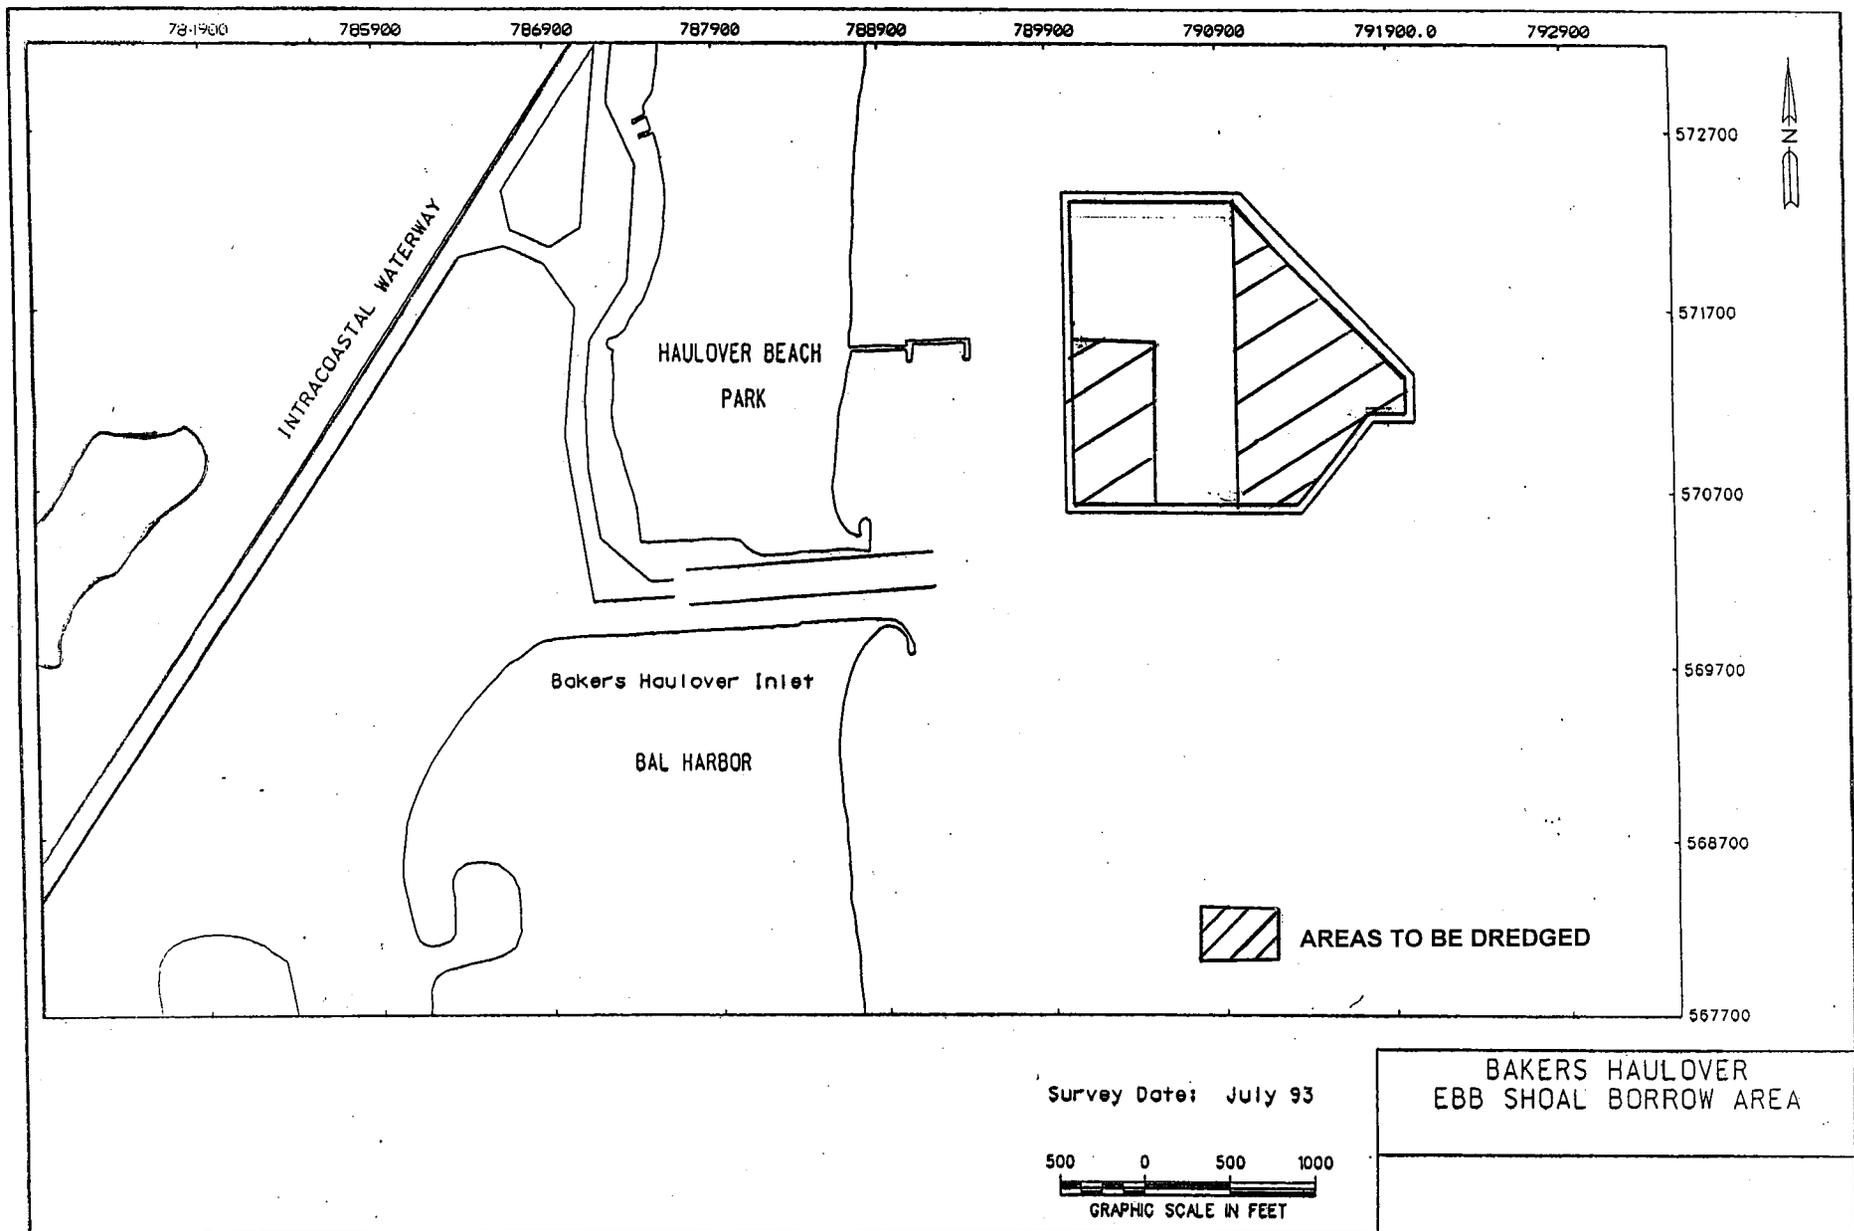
Potential borrow area at Baker's Haulover ebb shoal.
